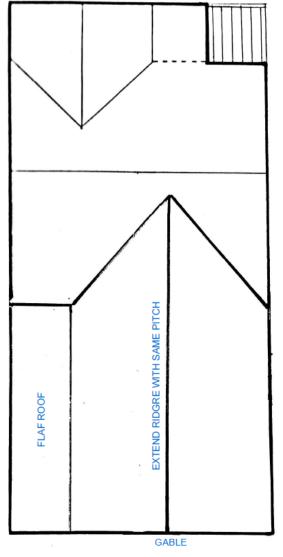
Proposed Roof Plan Option 2-Leaves Original Roof Configuration Intact
